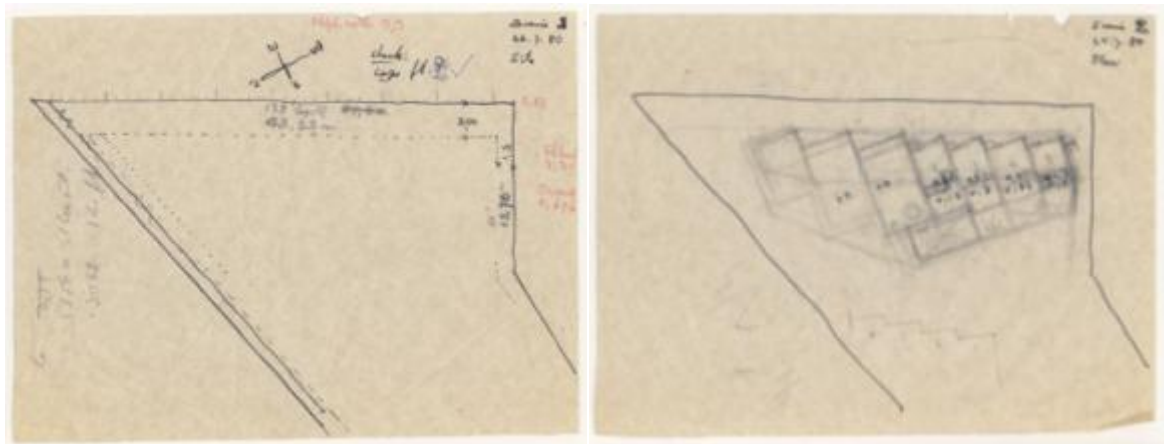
Left: Fagan's site study (Fagan archive - Job No. 8011, 25/07/1980). Right: First plan exploration (Fagan archive - Job No. 8011, 25/07/1980).
